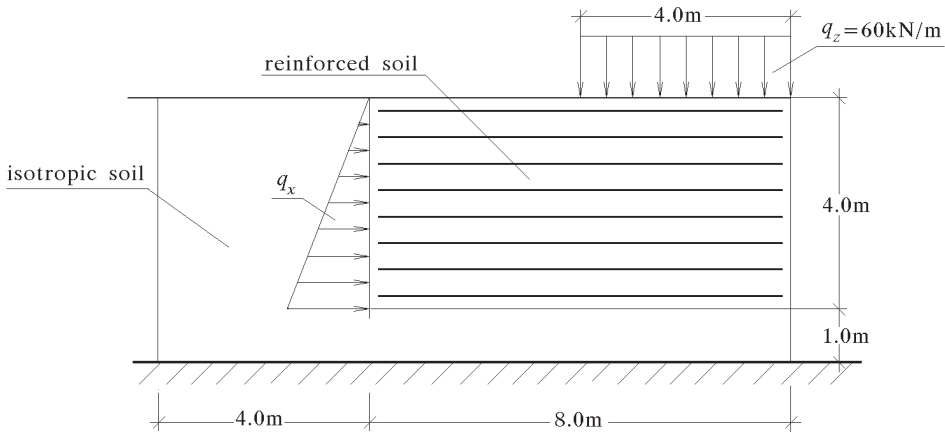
Diagram of reinforced soil retaining wall structure with backfill reaction
